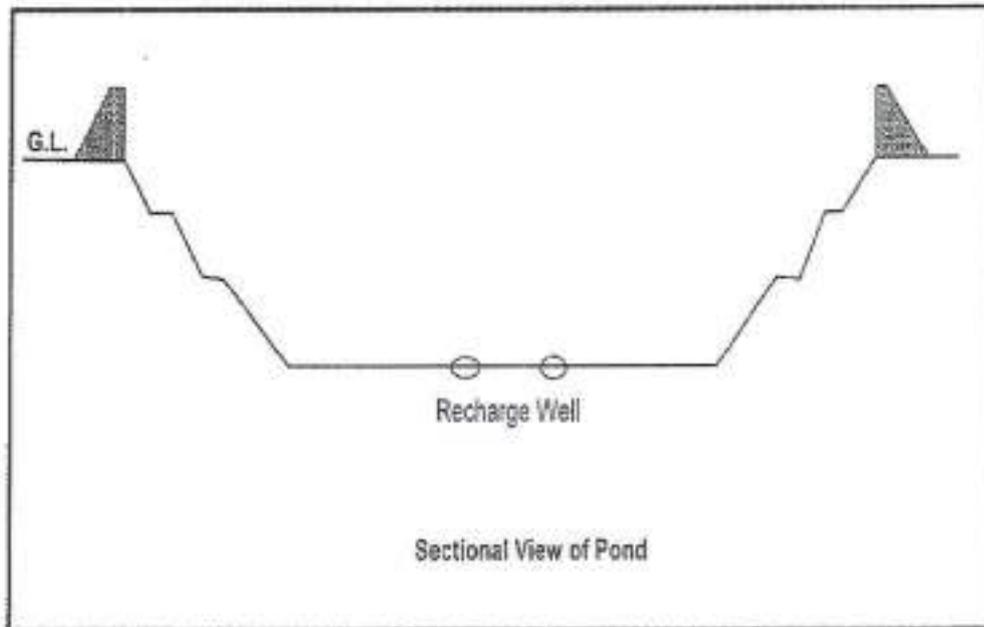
Schematic Diagram of Pond Recharge Constructed in Pond
